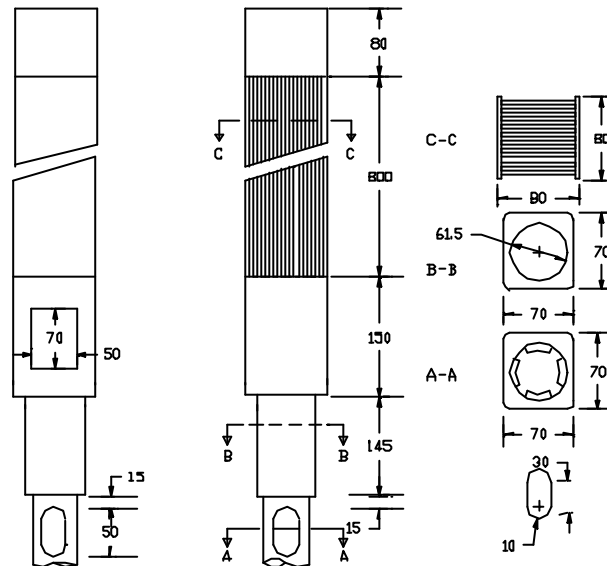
ETRR-2 fuel element (dimensions in mm).
